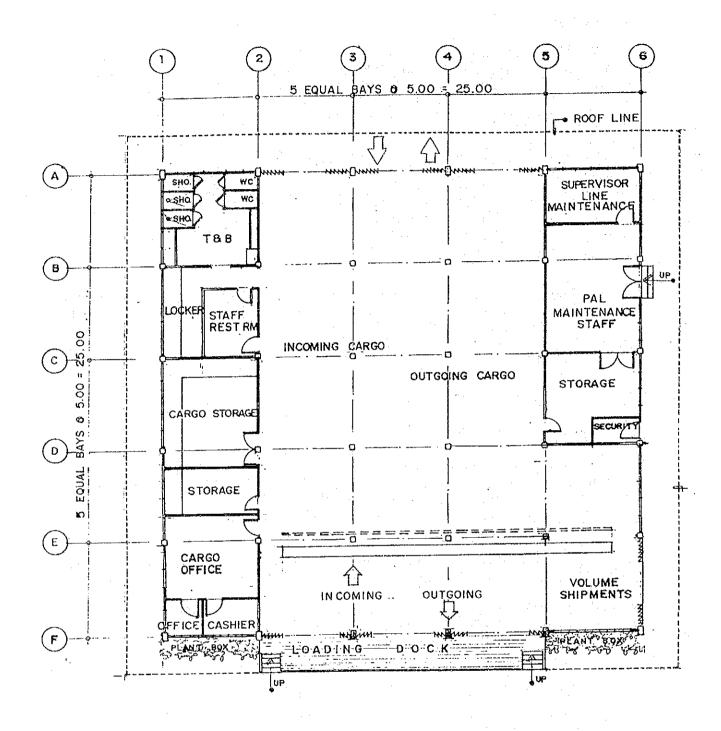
Floor Plan of Existing Cargo Terminal Building
